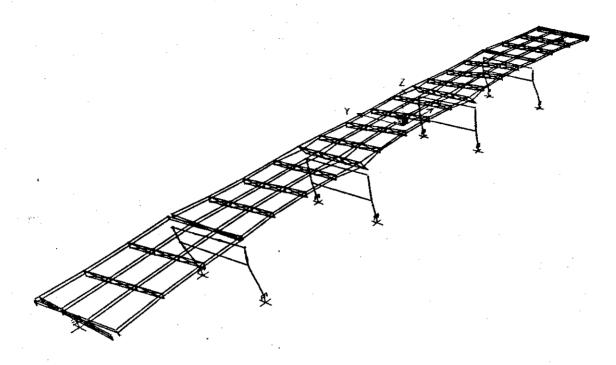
Mode 4, Period 0.1229 Seconds (Old Wahite Ditch Bridge)
